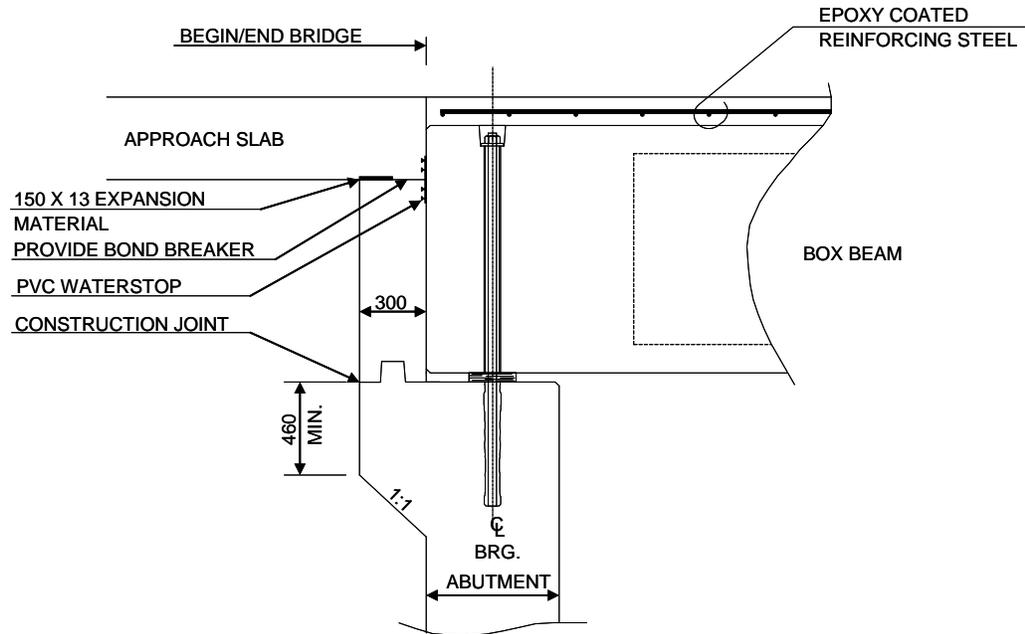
Box Beam Type G Bridge End Detail
